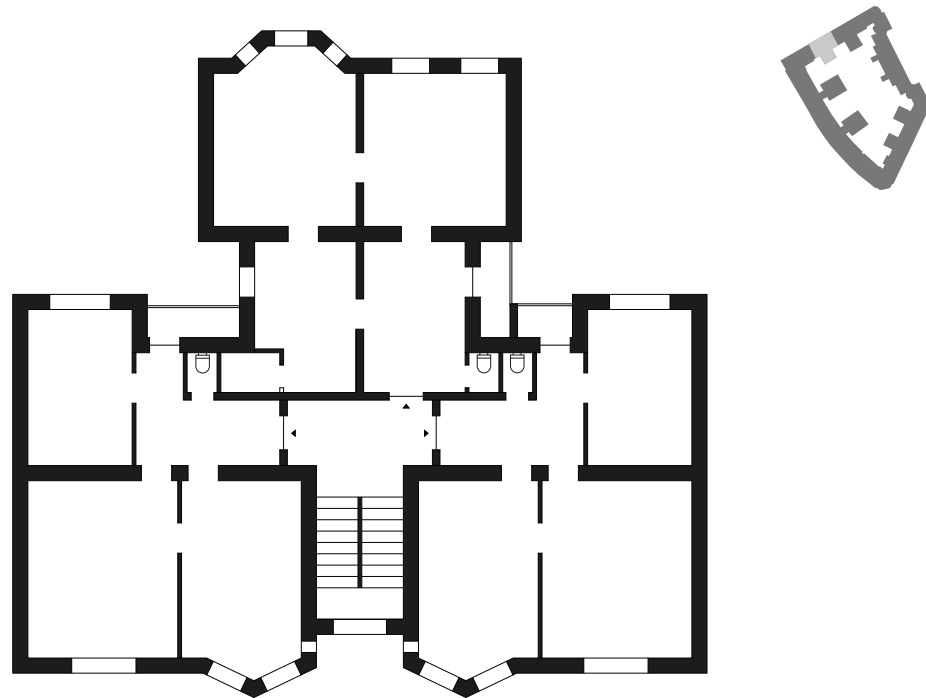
Plan, Metzleinstalerhof - 1:200
